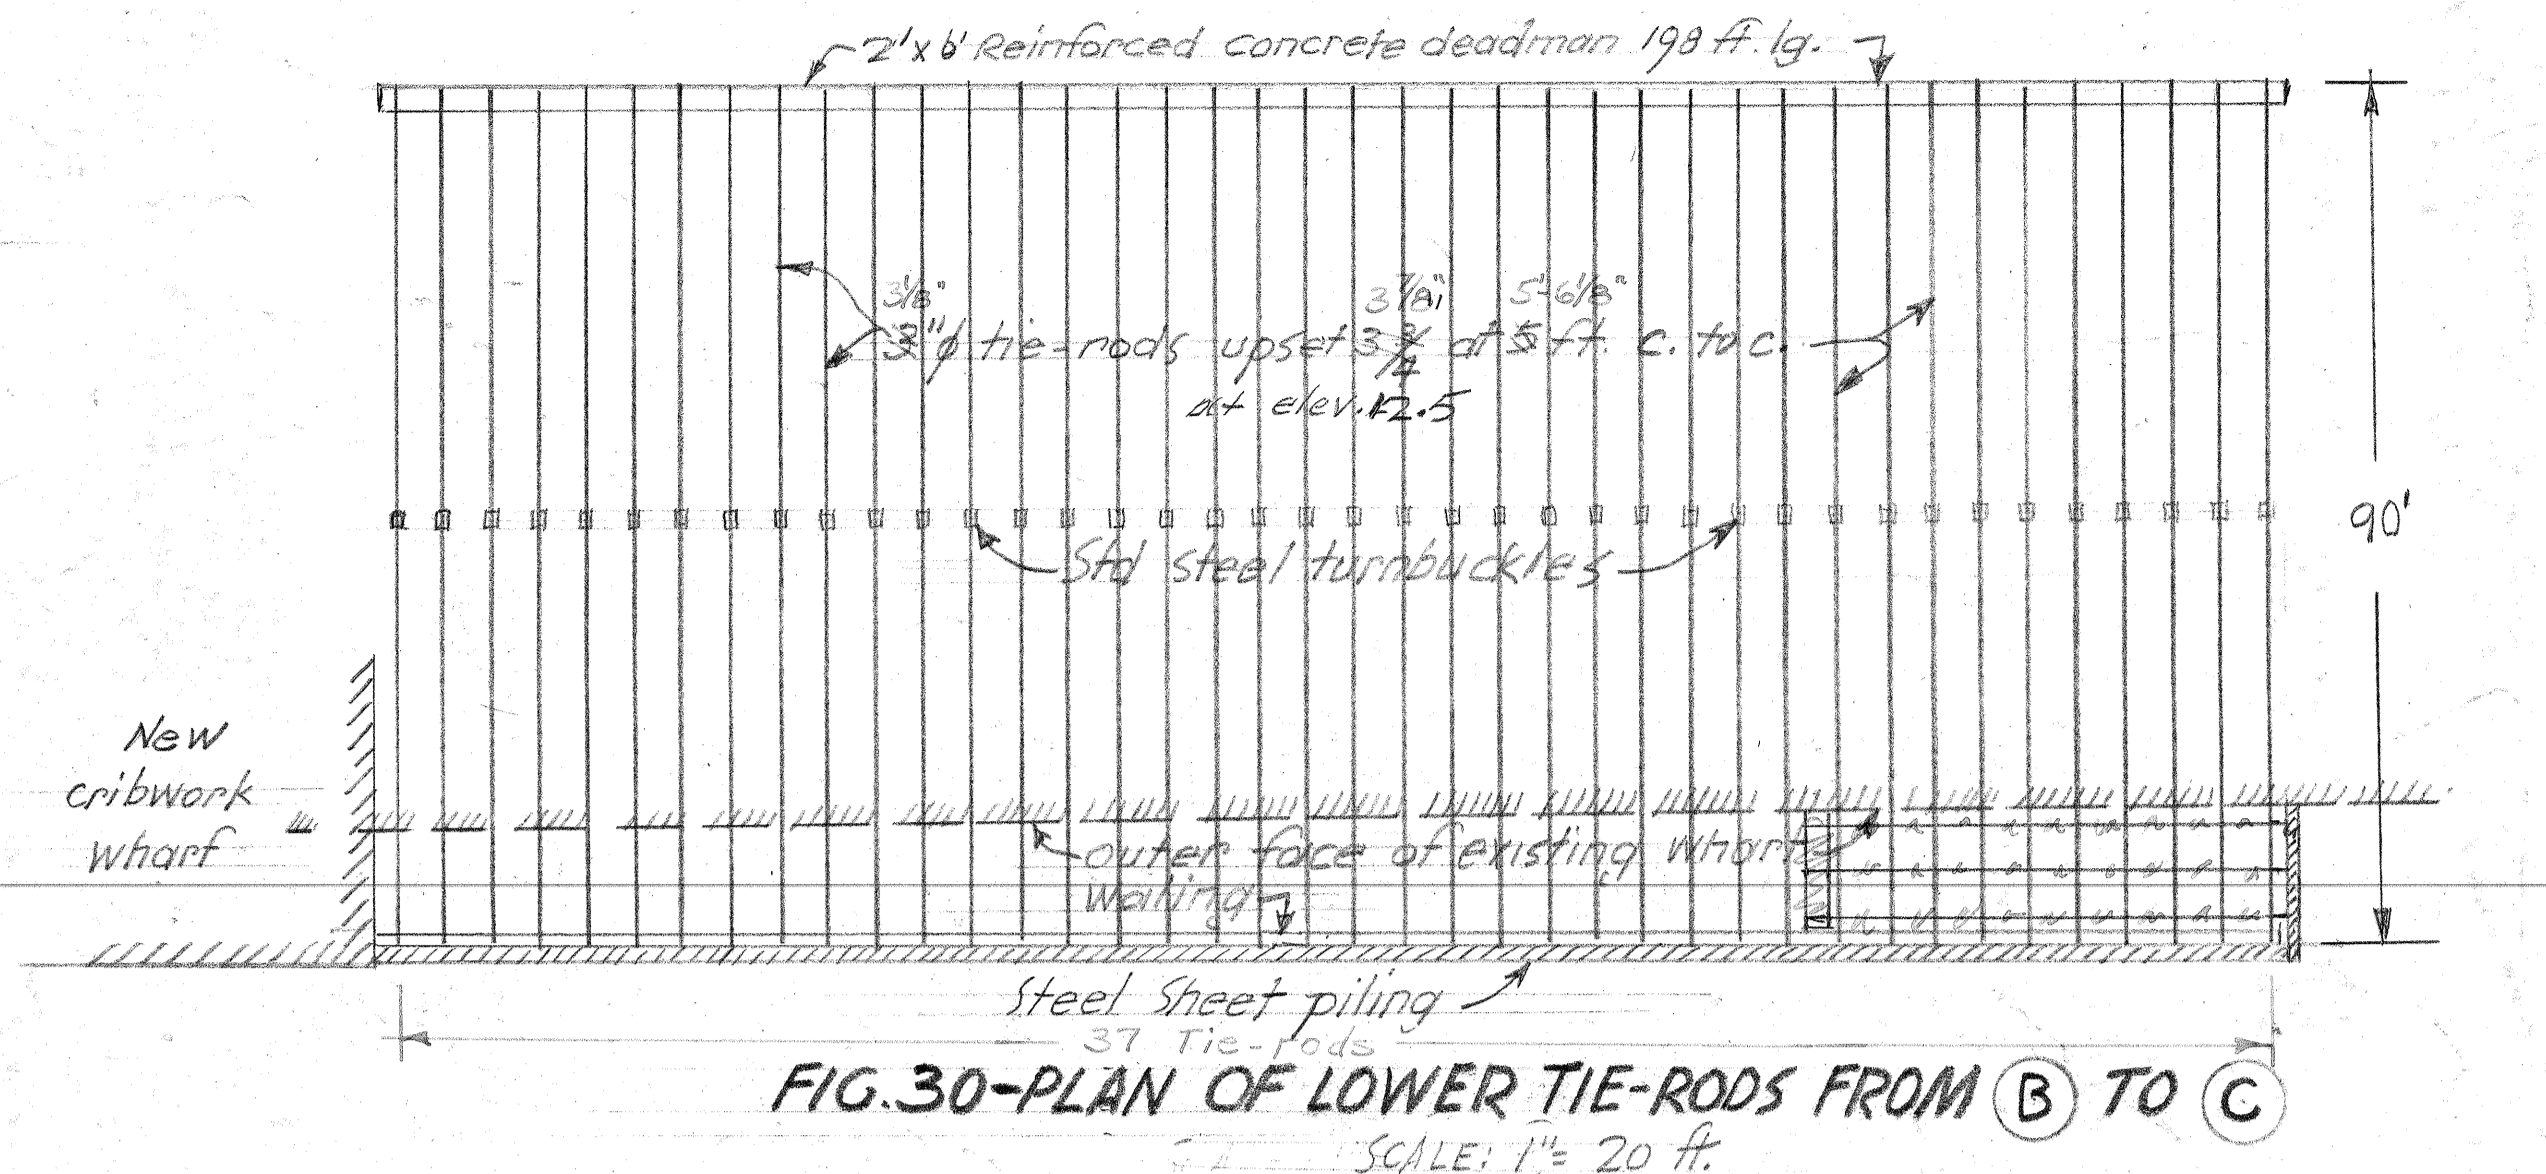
PLAN OF LOWER TIE-RODS FROM B TO C
